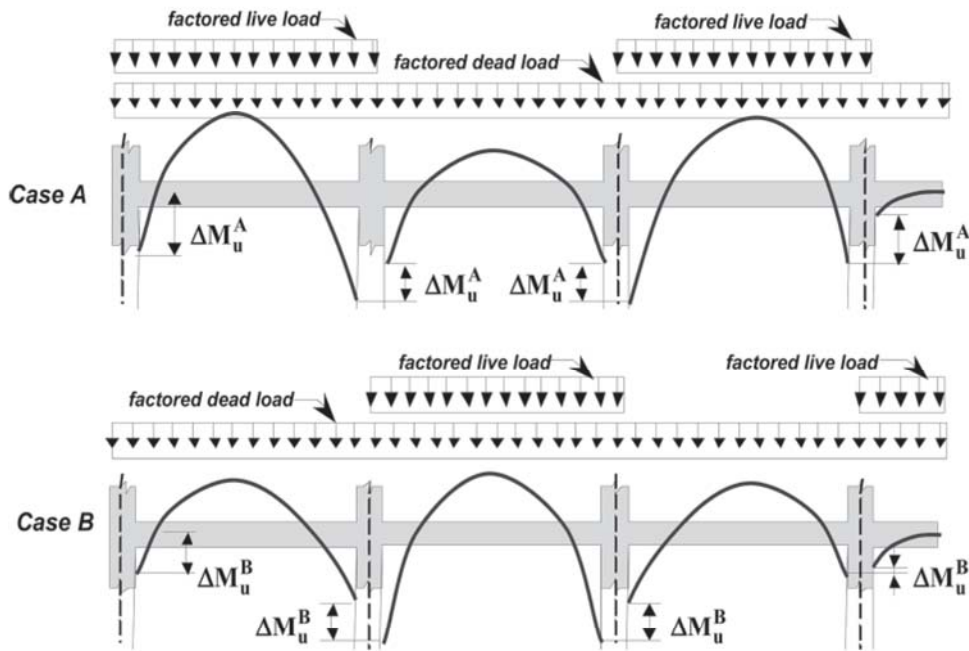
Girder unbalanced moment to be transferred to columns.
